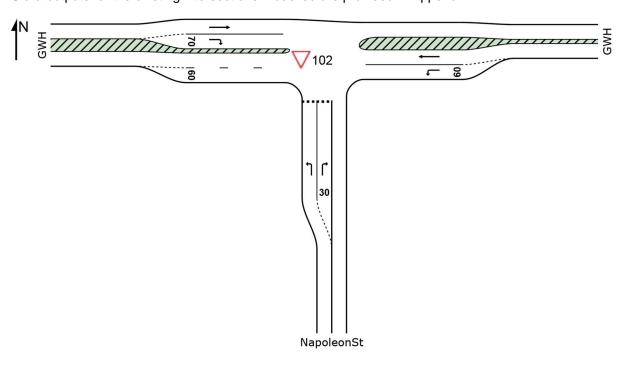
Modelled existing intersection layout – Great Western Highway / Napoleon Street
